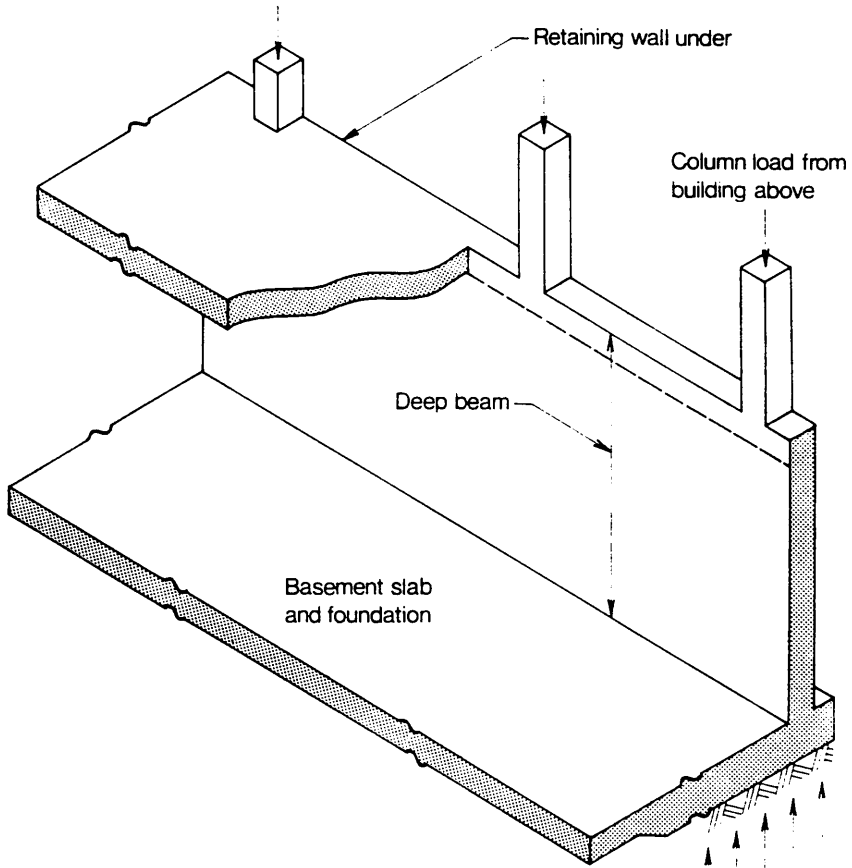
Typical deep beam use to spread column loads to a continuous foundation
